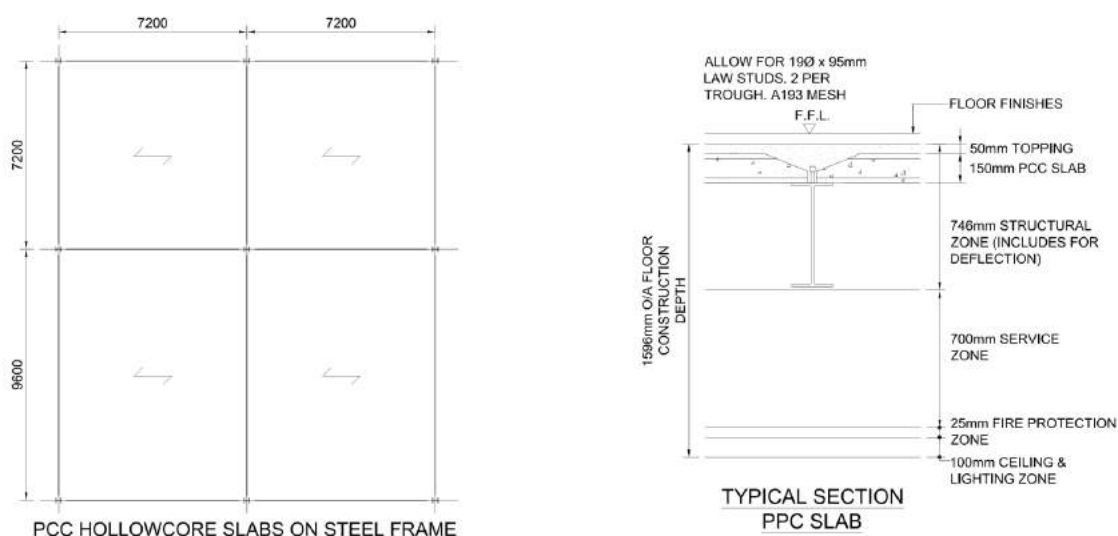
General arrangement and section for a steel frame hollowcore slab solution
